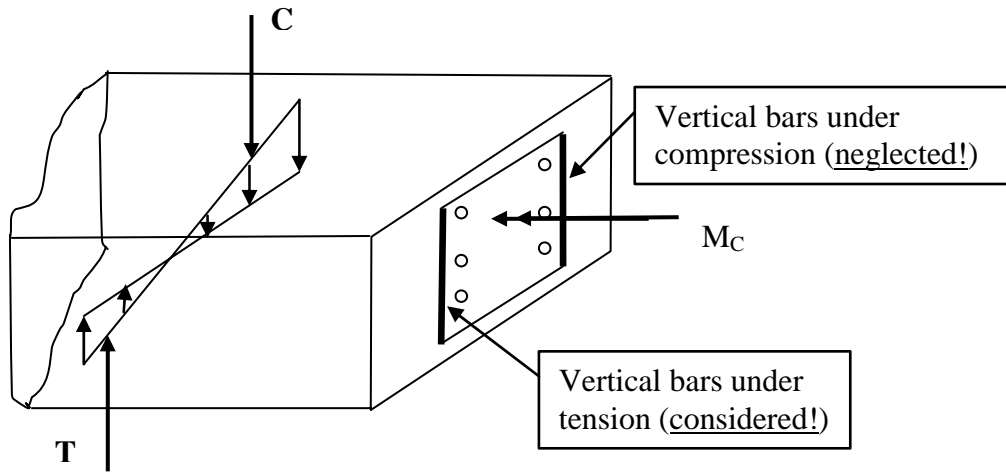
Sketch of the wall cross section with the typical stress behavior due to a horizontal bending moment.
